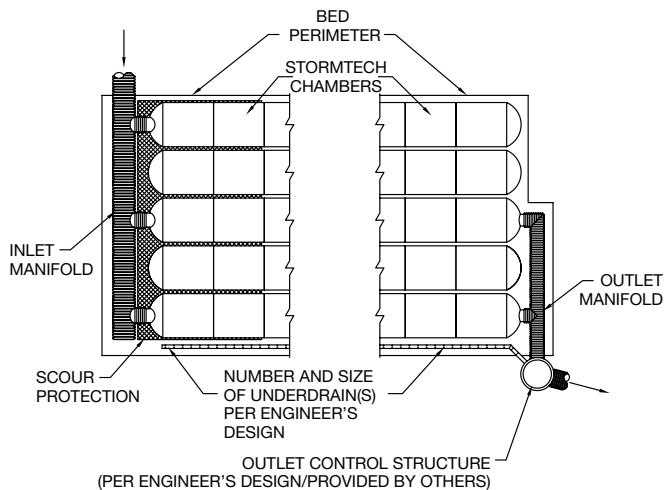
Typical Inlet, Outlet and Underdrain Configuration
